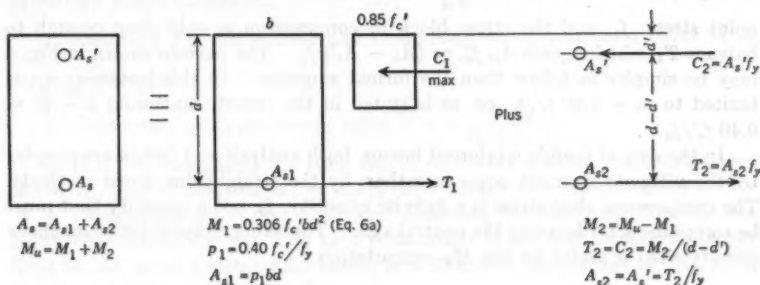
DESIGN OF A DOUBLE REINFORCED BEAM
